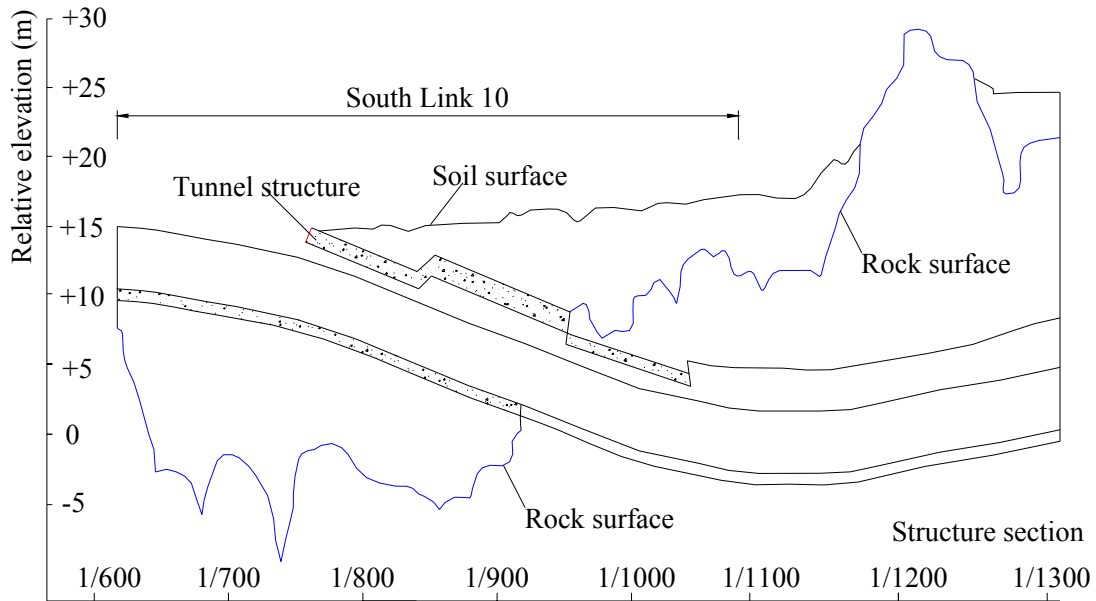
Longitudinal section of SL10 showing structures and geotechnical layers.
